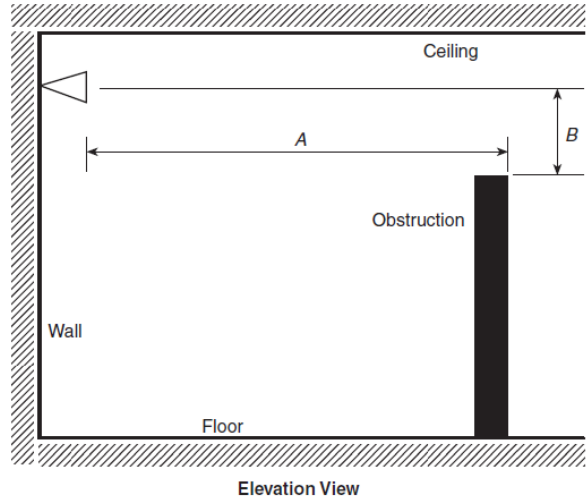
Suspended or Floor-Mounted Obstructions (Extended Coverage Sidewall Sprinklers) in Light Hazard Occupancies Only.
